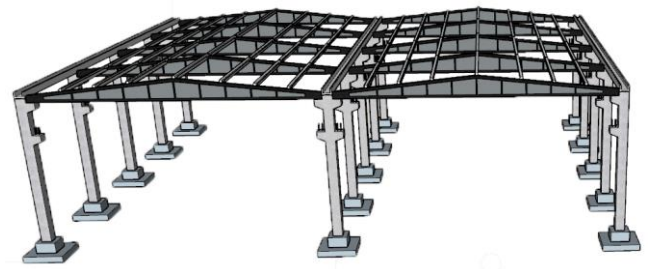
A general configuration of typical single-story precast RC buildings in Turkey
